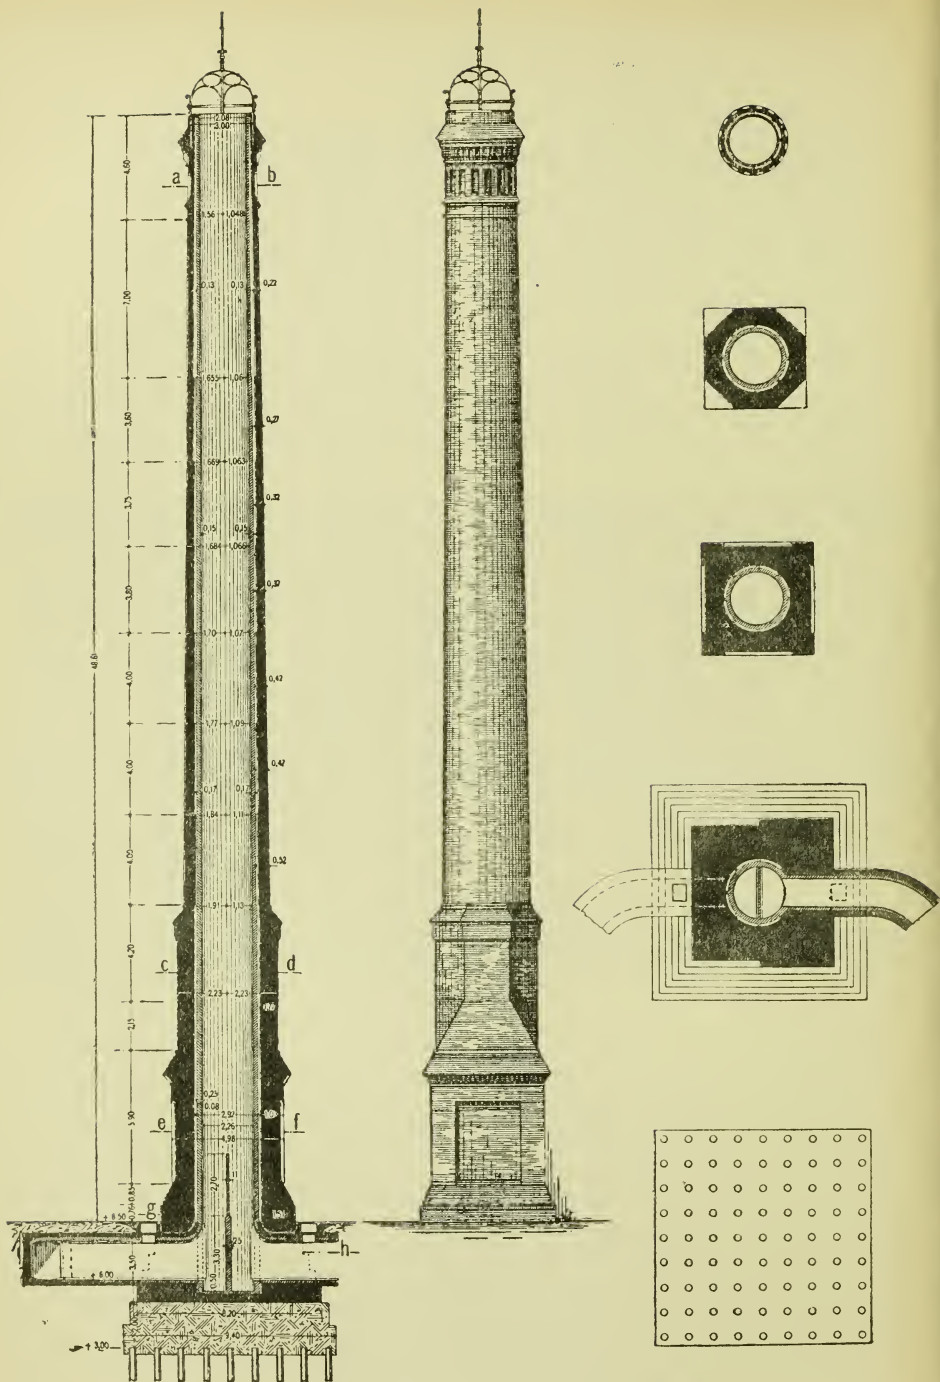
Hamburg Destructor—Chimney Shaft.
